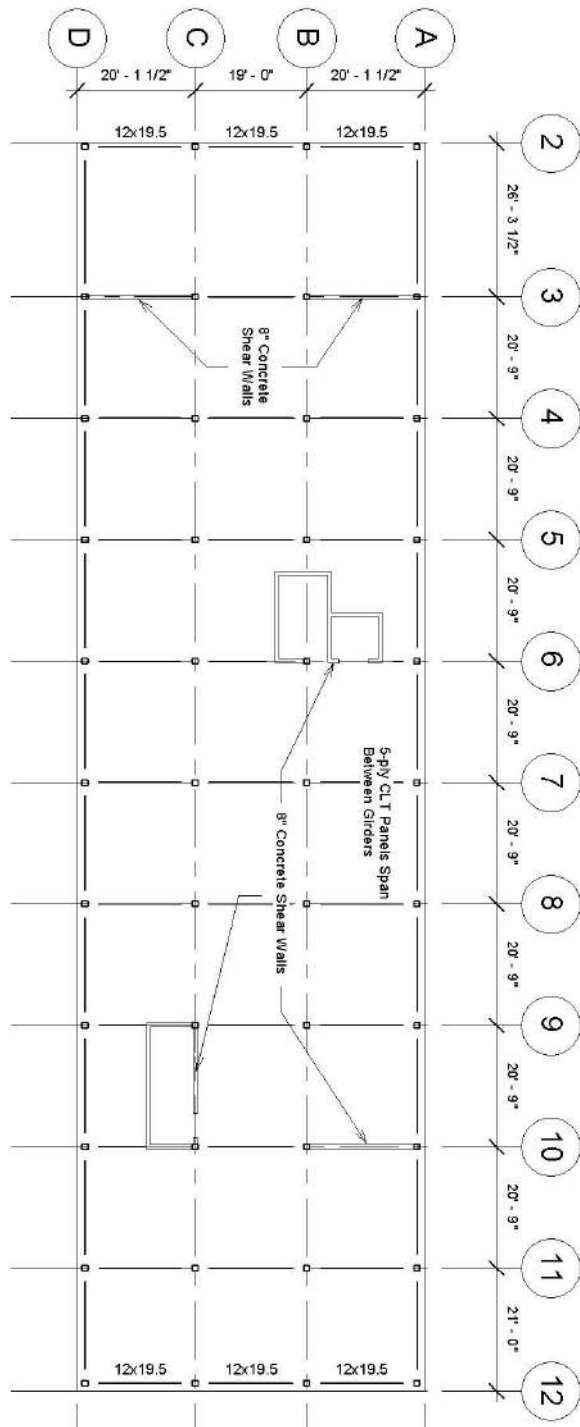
Typical Level Structural Plan. Unless otherwise noted, girders are 15" deep typ.
